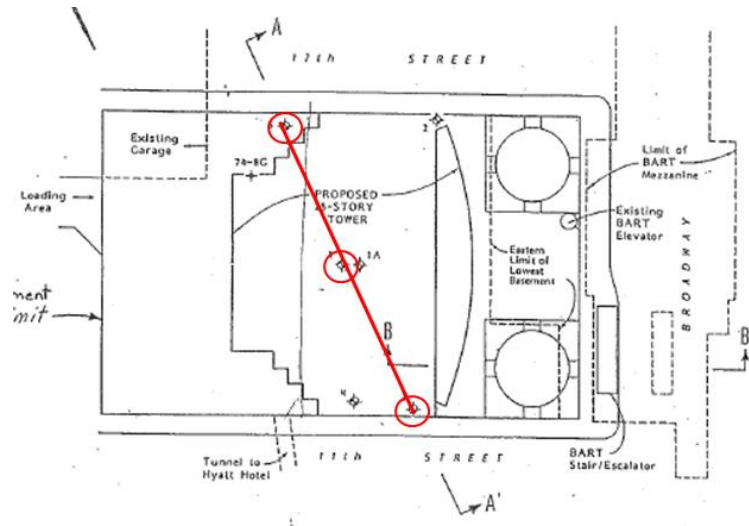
Site layout showing the cross-section used in construction of the specific soil profile
